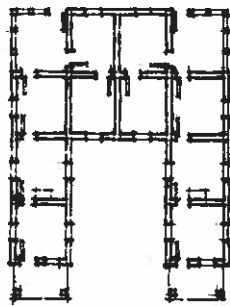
The Camelback. Floor plan from the Tenth Street Historic District.
